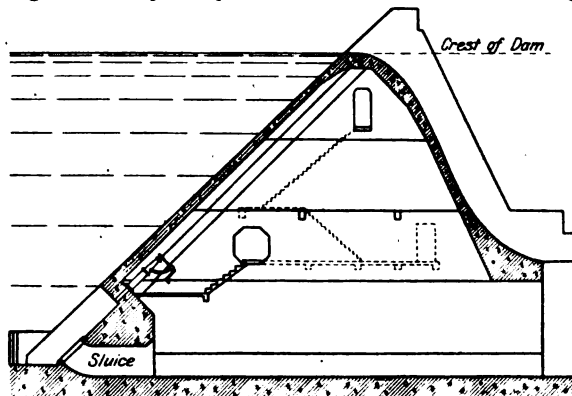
Cross-Section of Hollow Concrete Dam at Sluice-Gate Bay. Cedar Falls Plant.
